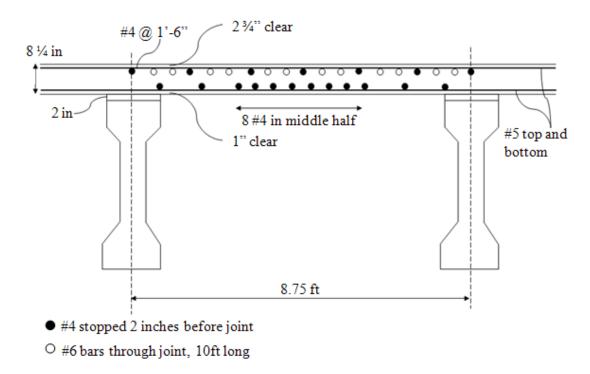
Example deck cross-section using current Georgia continuous-deck detail
